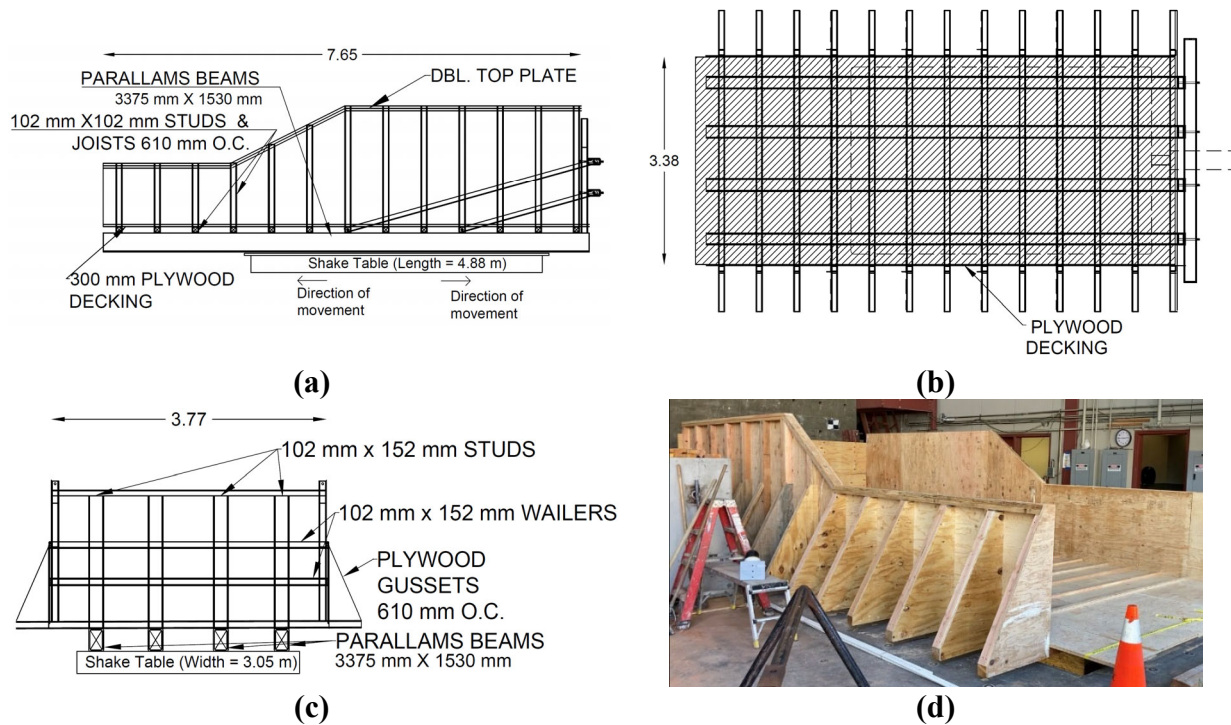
Container for shake table testing of full-scale rail embankments: (a) Side view, (b) Plan view, (c) Back view, and (d) Picture of completed container.
